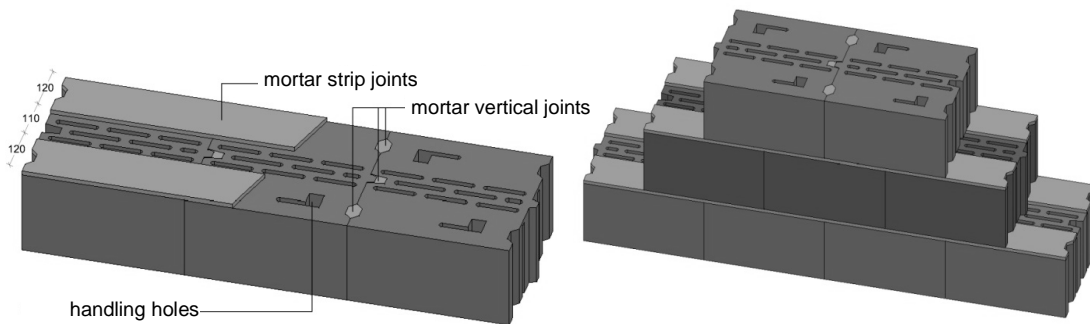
Masonry details schematics for lightweight concrete masonry (dimensions in mm)
